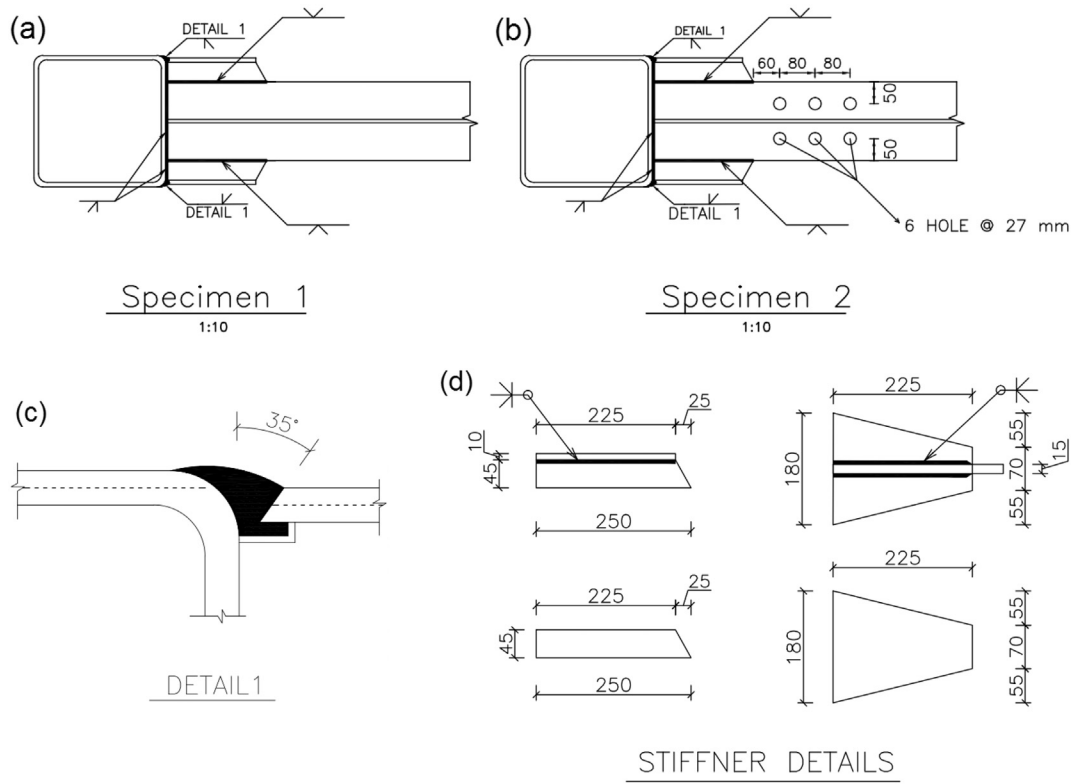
Details of the horizontal and vertical element of T-stiffener and welding to the column.
